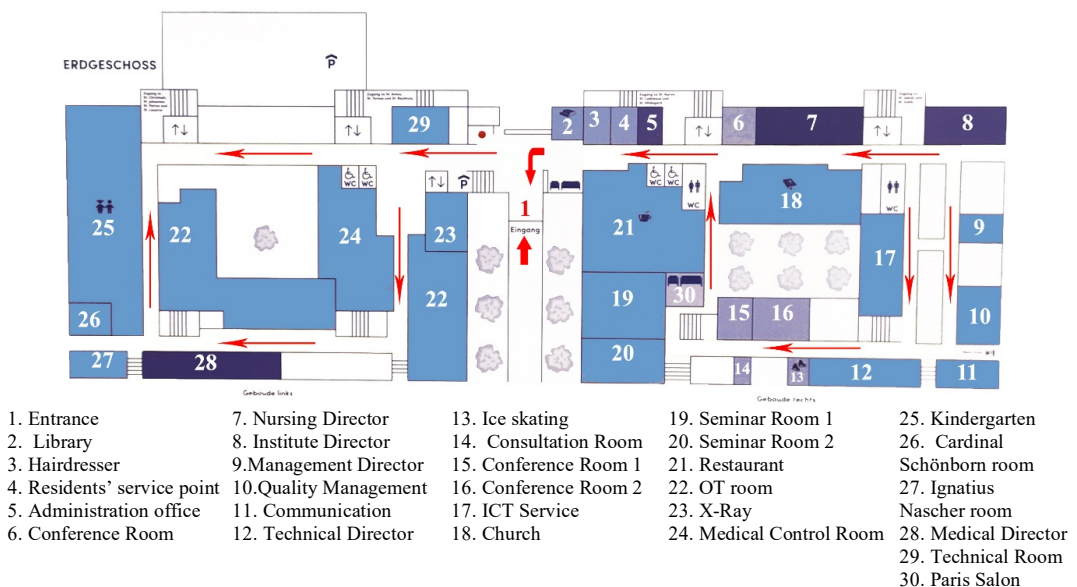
Floor plan of the Alzheimer's center (ground floor), illustrates the OT rooms' layout
